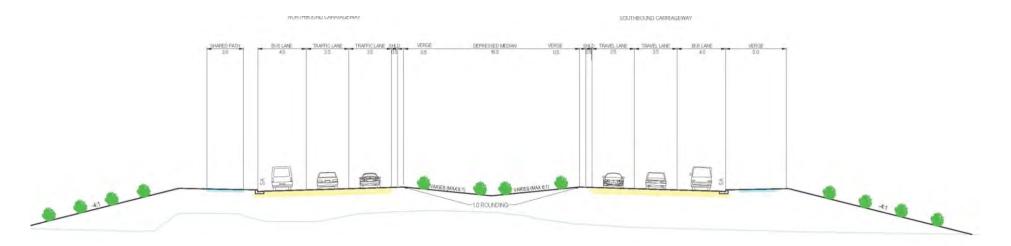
Indicative cross section and elevation of the proposed fill, about 500 m north of Vicar Park Lane (about chainage 3500)
